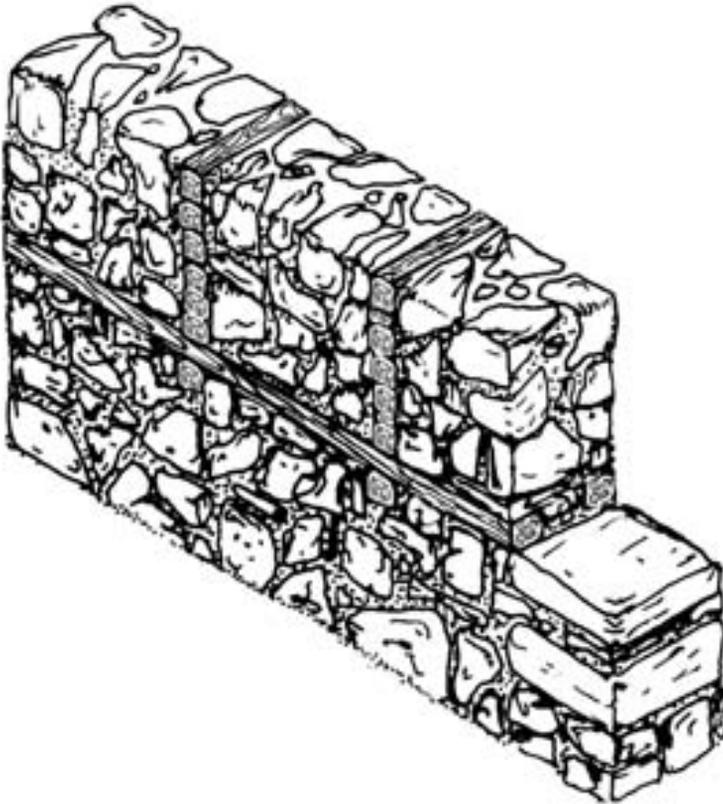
Timbered wall in Tsountas House, sketch by author
